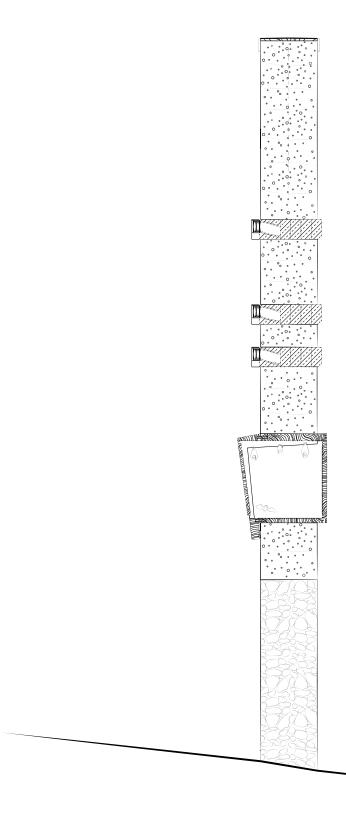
VIVARIUM CHIROPTERA ROOST STABILISED EARTH WALL SECTION NOT TO SCALE (Author, 2016)
